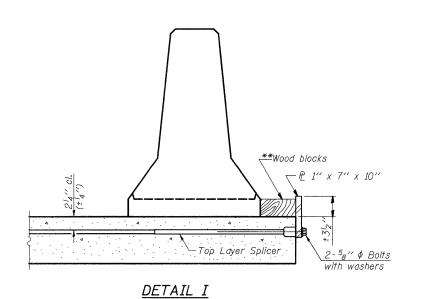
Detail I - With Bar Splicer or Couplers: Connect one (1) 1"x7"x10" steel P to the top layer of couplers with $2^{-5}8'' \phi$ bolts screwed to coupler at approximate © of each barrier panel.
